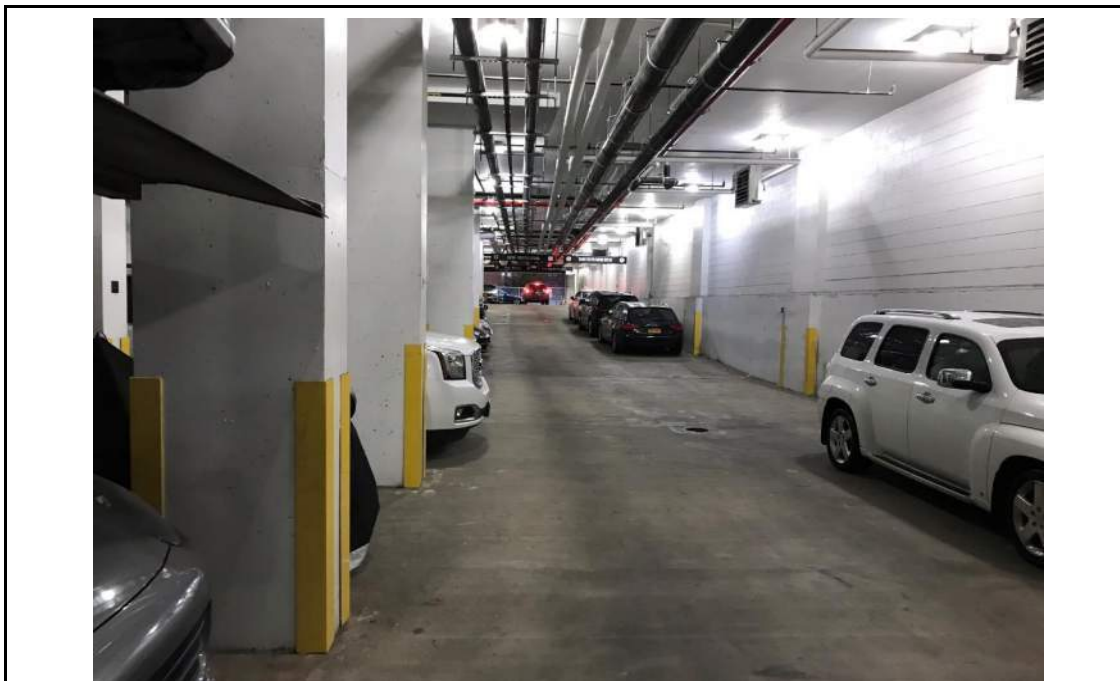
Subgrade parking lot concrete slab, facing west. 6 February 2020.
